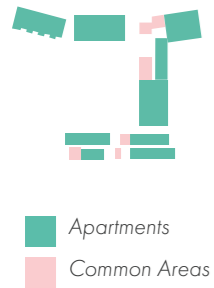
Eltheto Housing & Healthcare typical floor plan (Scale - 1:1000). Source: 2by4 Architects (2015) - re-elaboration of the author
